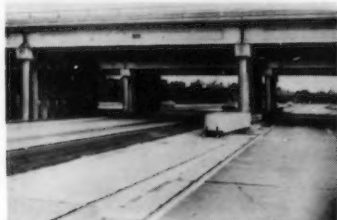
HI-DRO Crash Cushion at Bridge Pier in Narrow Median
